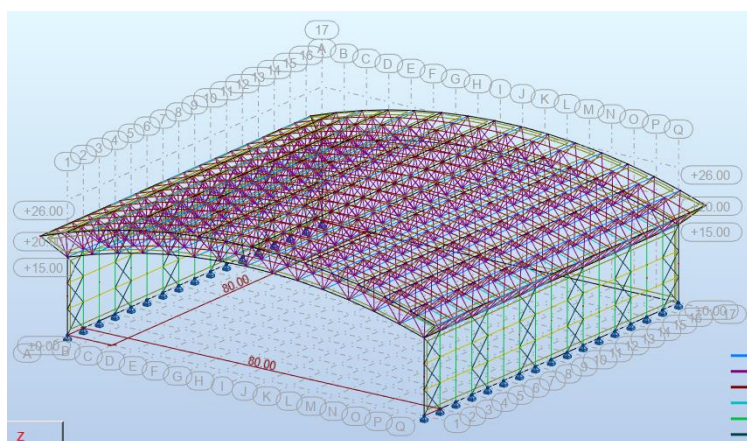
Layout and dimension of arched space truss showing the spacing between main columns span of arch span truss and height of aircraft hangar.
